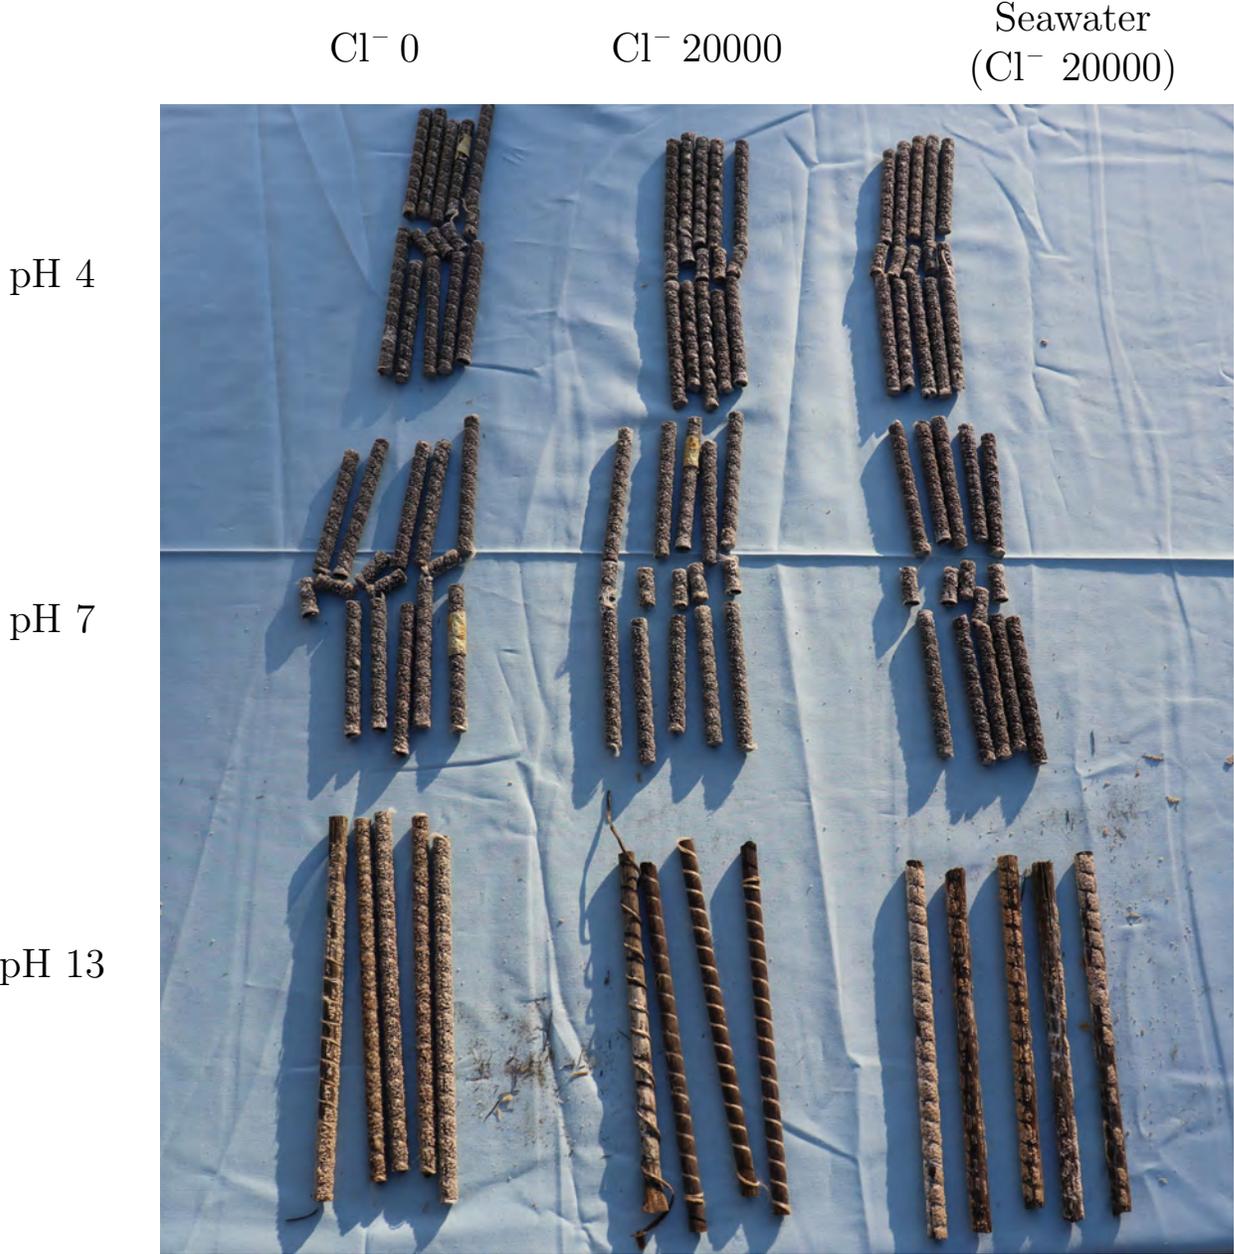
Transverse shear failure mode of Type A #3 rebars
